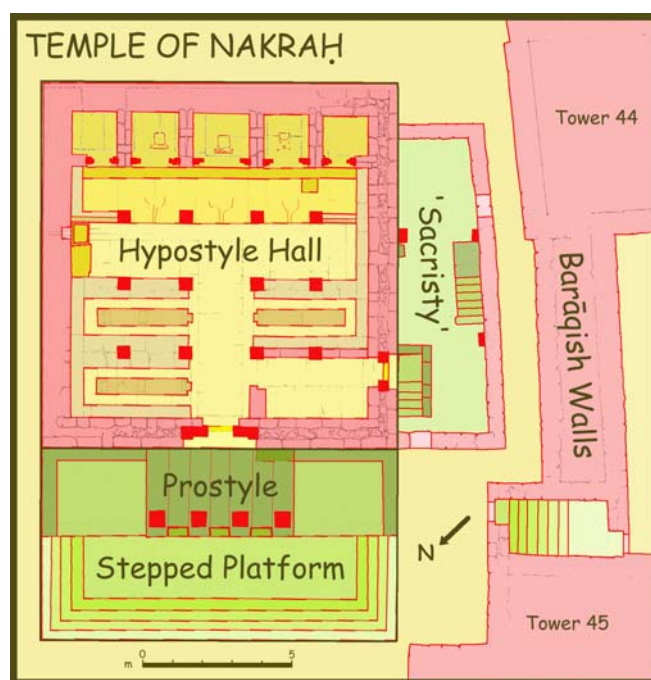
A plan of the temple of Nakrah and adjacent walls
